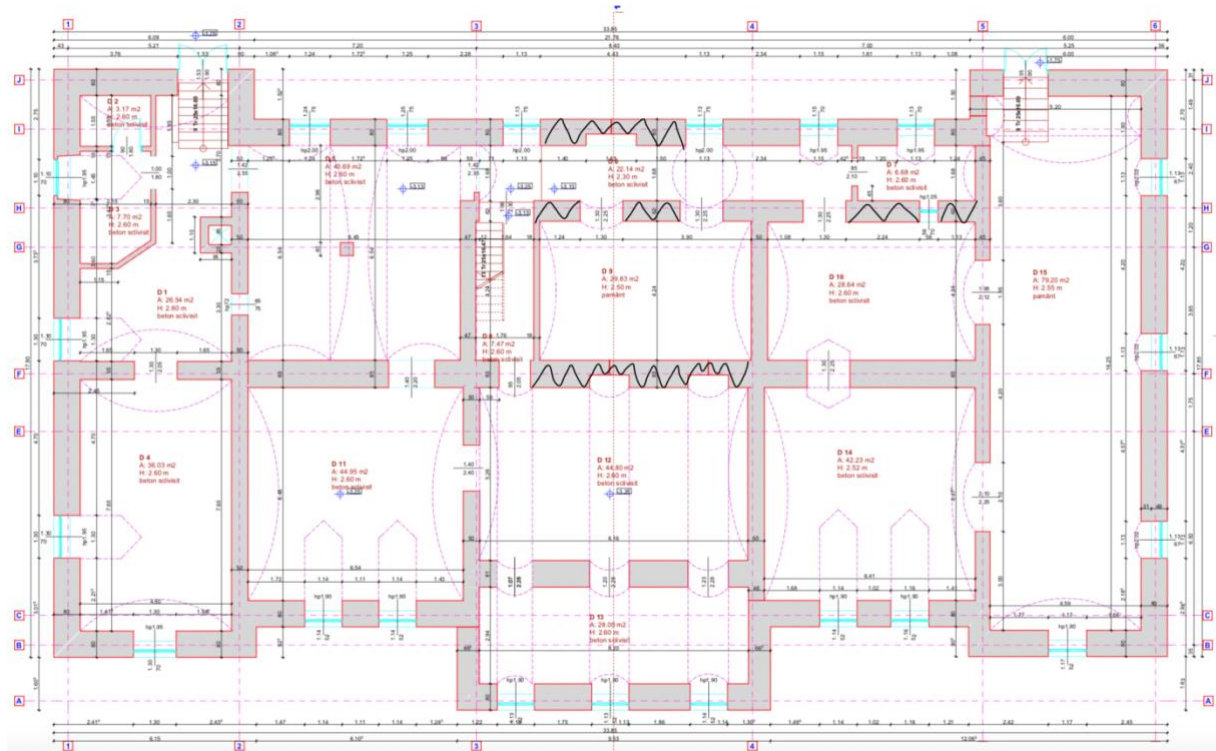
Basement floor-plan of Konopi manor house, North to the right-hand side, west to the top (the direction of the chapel). The zig-zags represent wall sections from older constructions.
